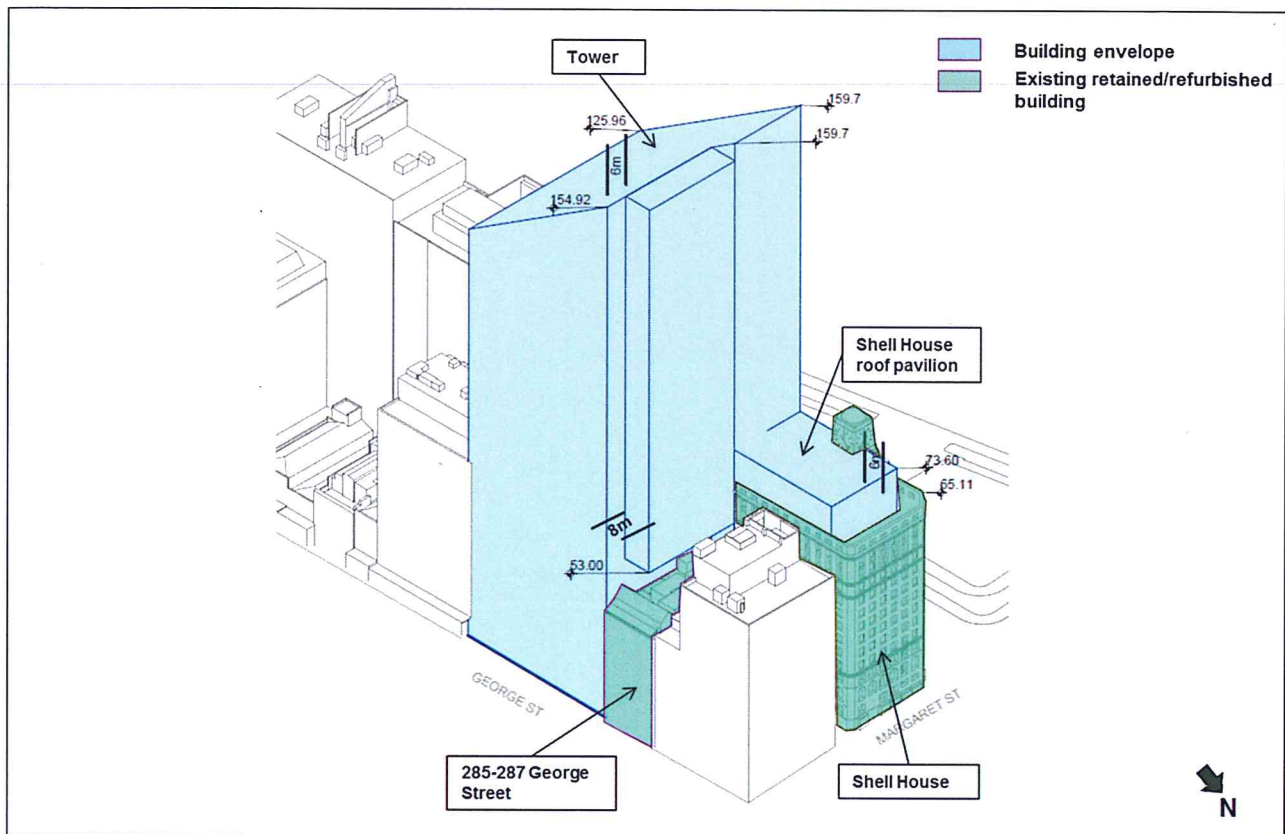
The Concept Approval building envelope (blue) and retained existing buildings (green)
